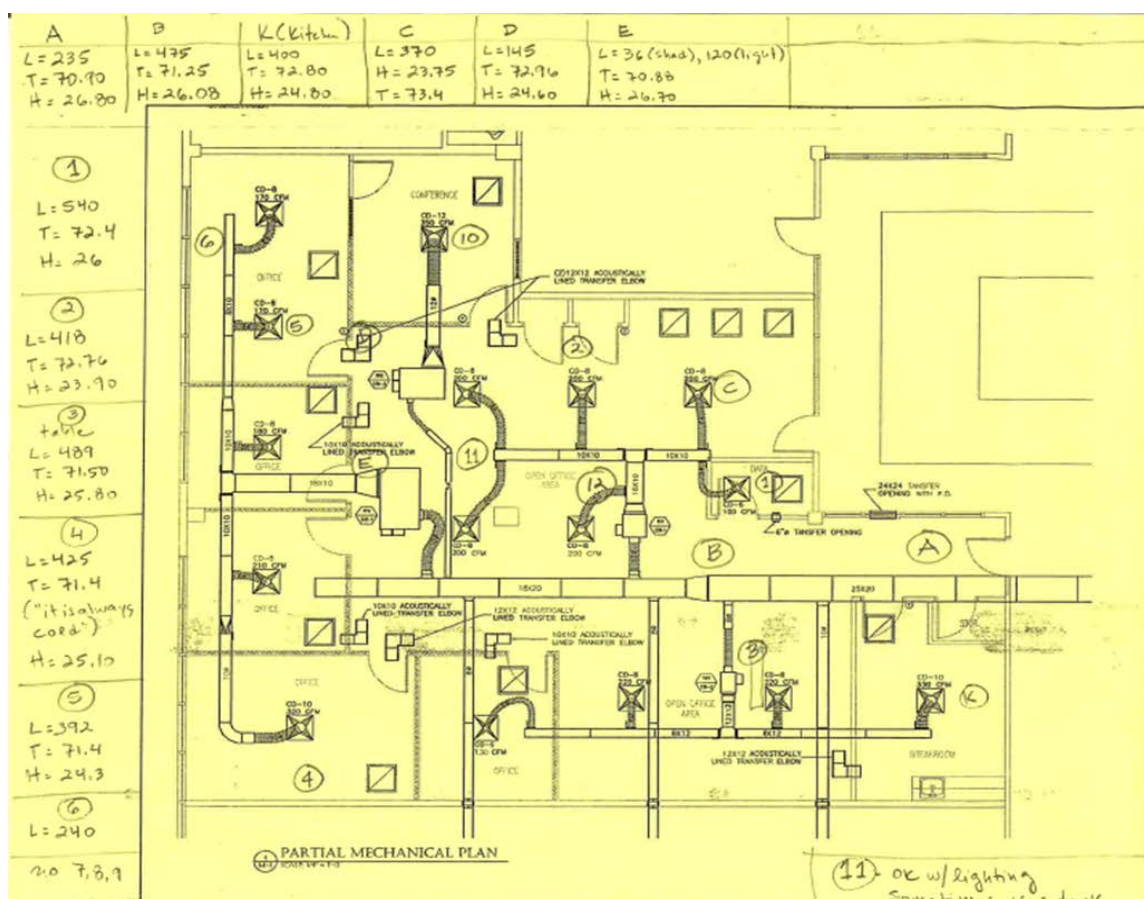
Example of Working Plan with Lux and Location Measures for Post-retrofit Site Visit.
